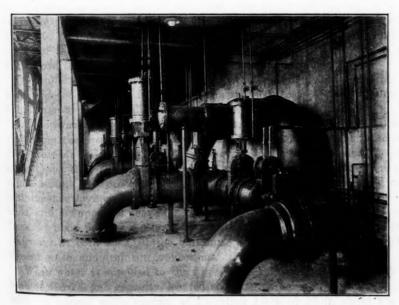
Influent, Effluent, Wash and Drainage Connections, New Filtration Plant, Atlanta, Ga.
